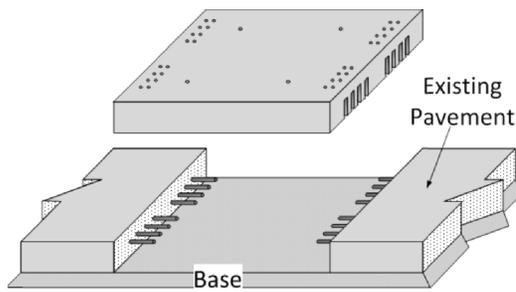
Variation of intermittent repair technique with dowel bars positioned in existing concrete pavement.
